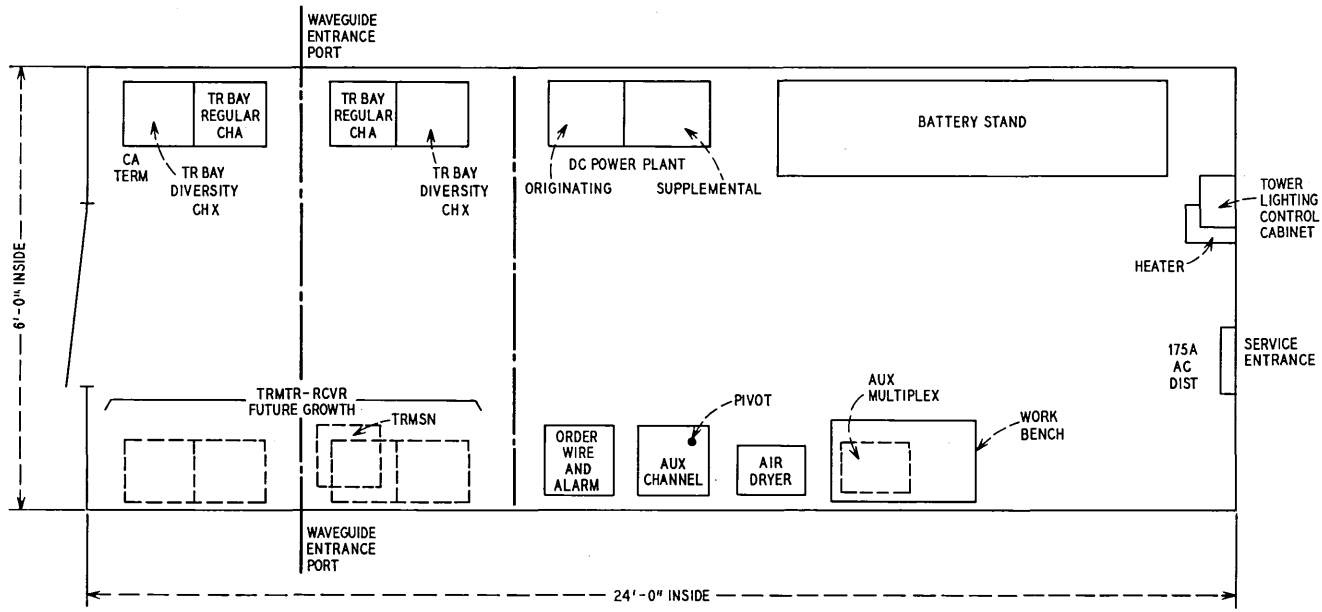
Floor plan layout for a TH-3 repeater station in a standard shelter.
